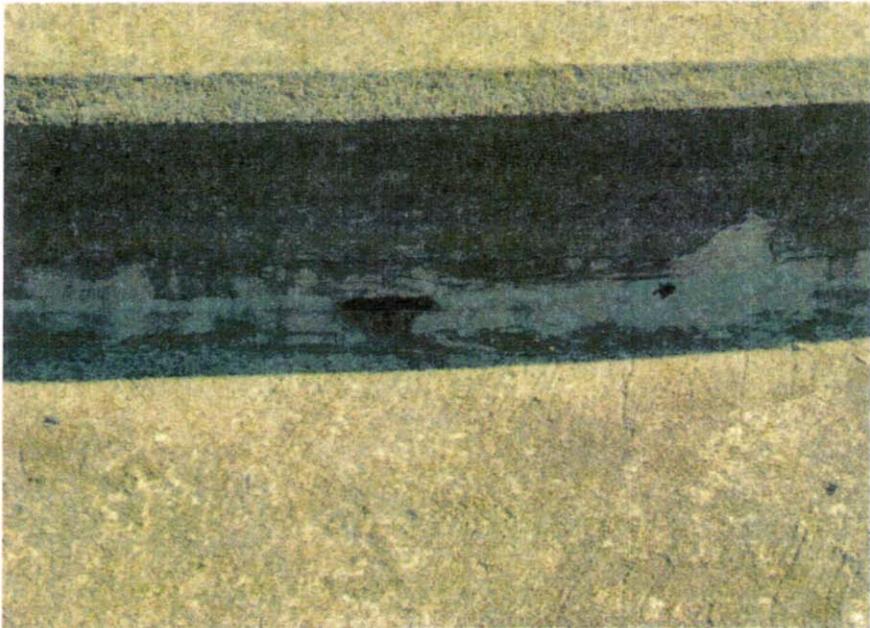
Clearwell Top Slab – Damaged Joint Sealant
